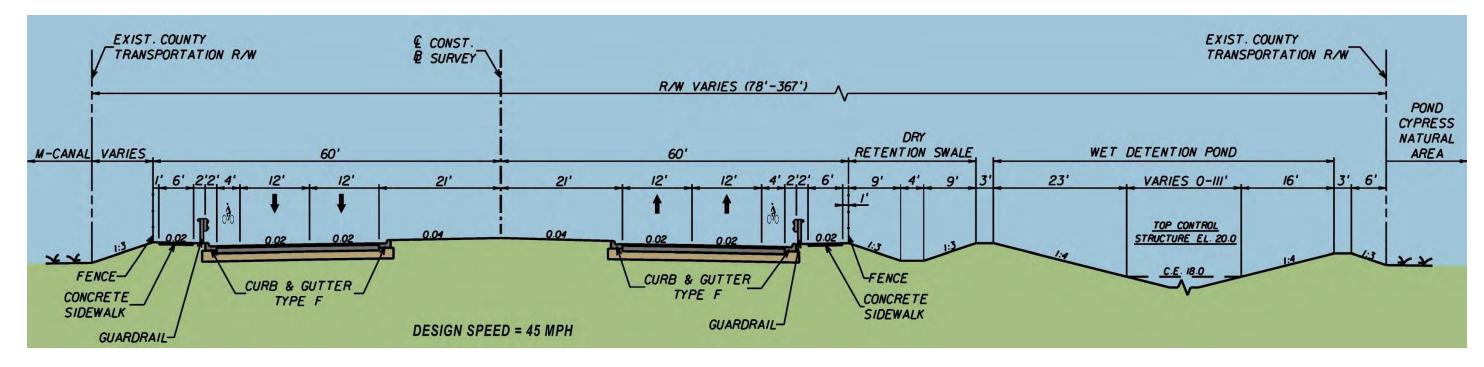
Proposed Typical Section-East Alignment, Bridge over M-Canal
